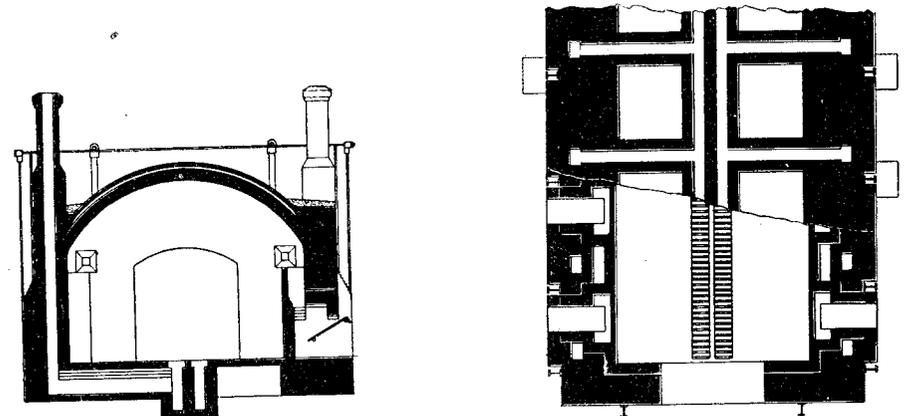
b and c. Section and plan of rectangular Eudaly kiln. (After Lovejoy.)
